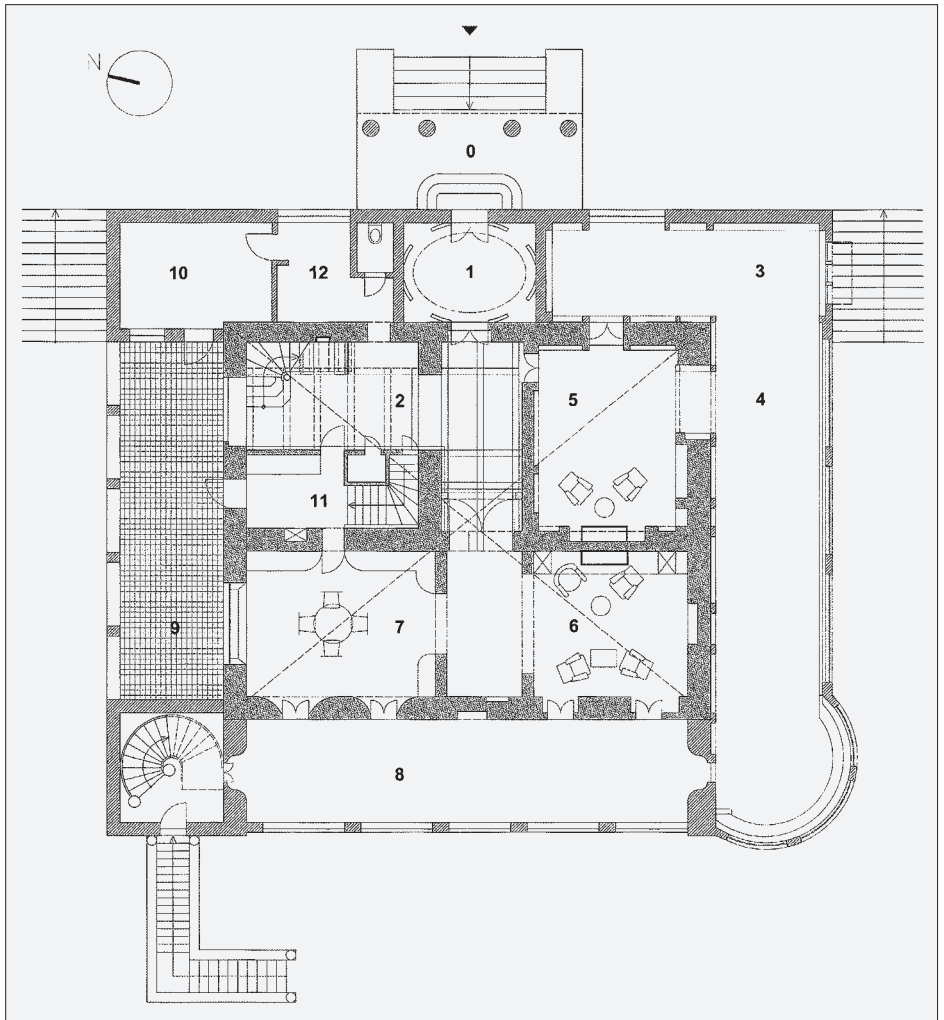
VILLA KARMA, FLOOR PLAN OF THE ENTRANCE FLOOR, AUTHOR'S DRAWING. 0 ENTRANCE PORCH, 1 VESTIBULE, 2 HALL 3 STUDY, 4 LIBRARY, 5 GENTLEMEN'S ROOM, 6 SMOKING ROOM, 7 DINING ROOM, 8 VERANDA, 9 TERRACE, 10 SERVANT'S QUARTERS, 11 STAIR TO KITCHEN IN BASEMENT 12 CLOAKROOM.
